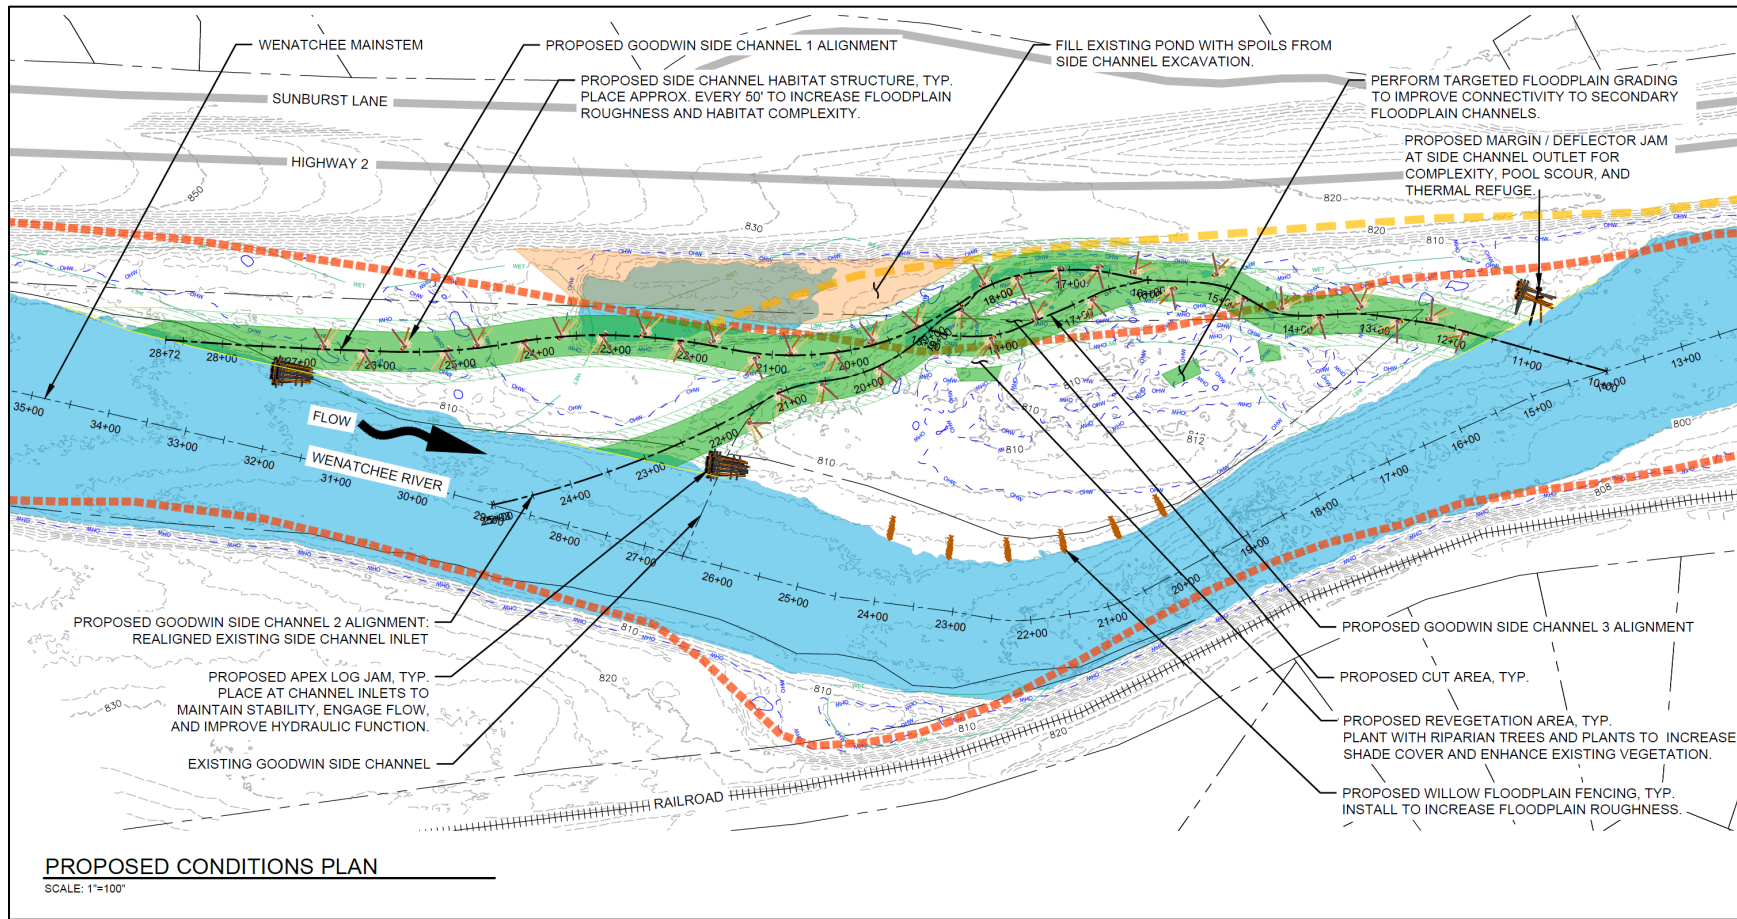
Excerpt of the preferred alternative (15%) plan as developed in August 2023.
